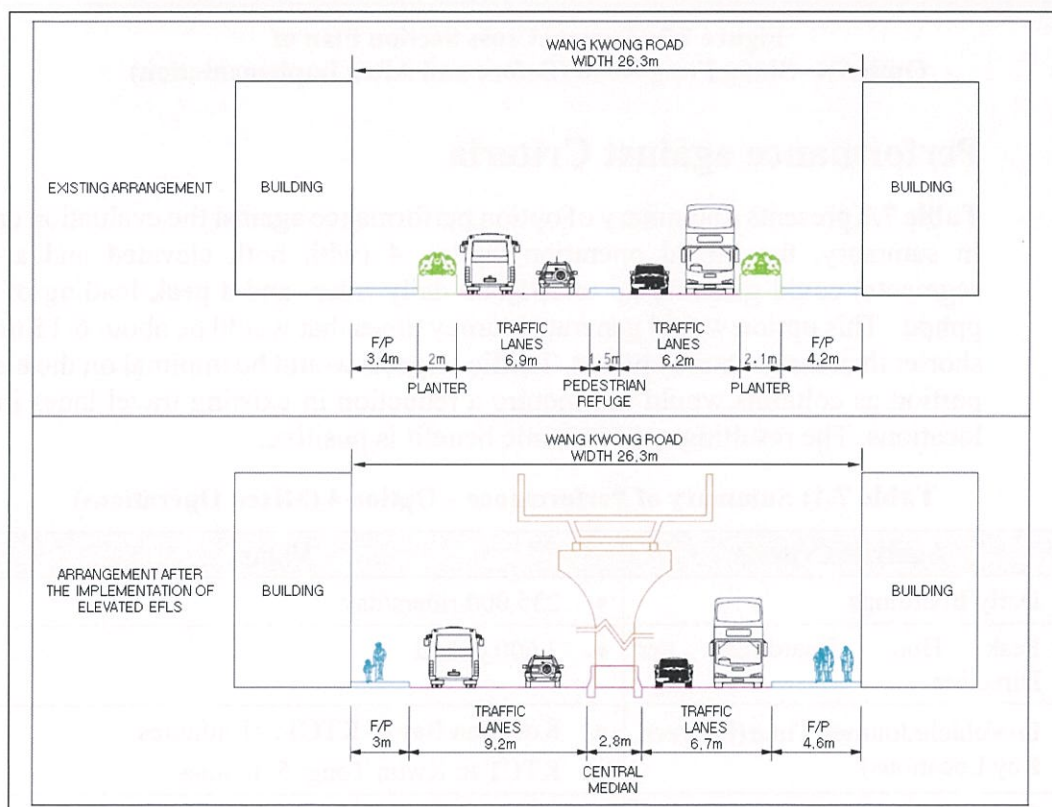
Typical Cross Section Plan of Option 4 – Wang Kwong Road (Before and After Implementation)
